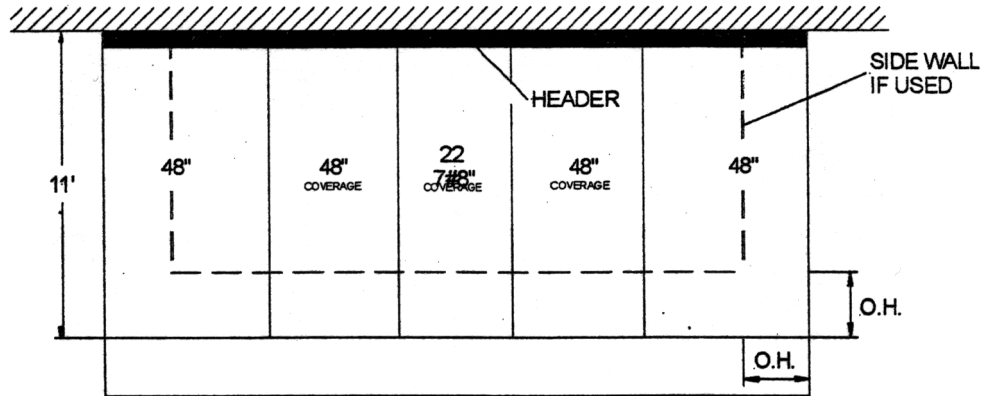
Plan VIEW FOR PANEL COVERAGE
